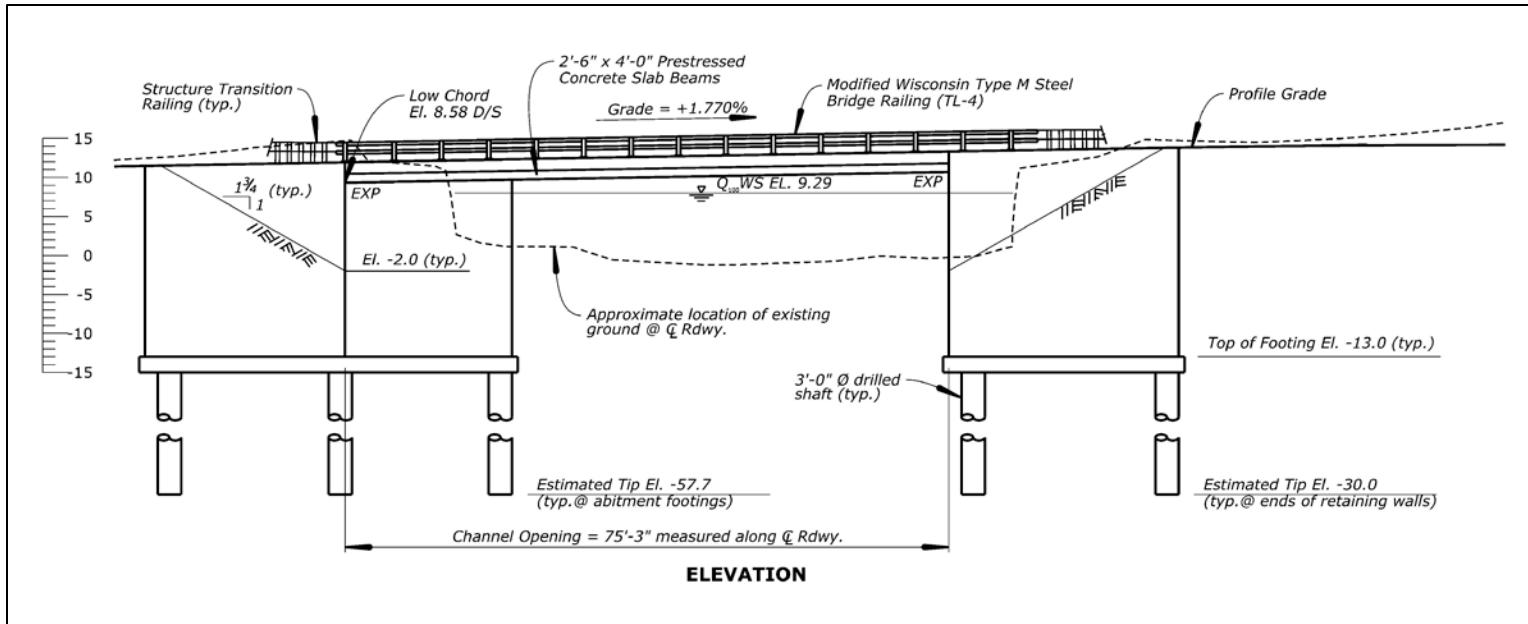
Proposed Preliminary Design of Bridge 2, Elevation View
